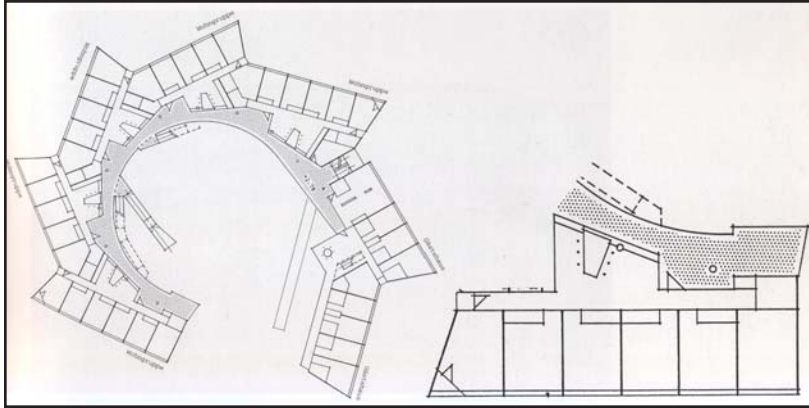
Typical floor plan and floor plan of a six-room apartment..
